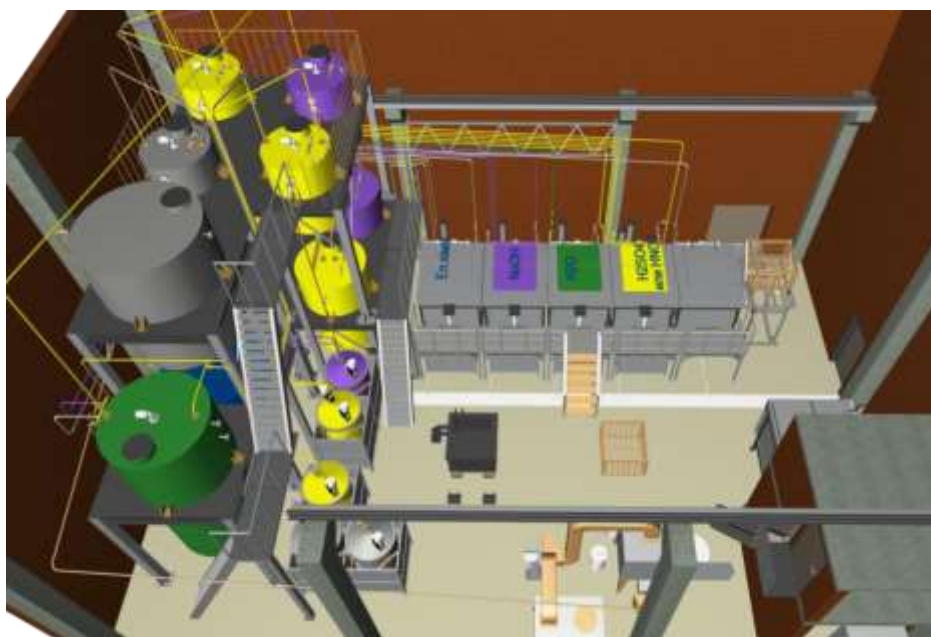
Equipment layout of the metal decontamination installation (top view).
